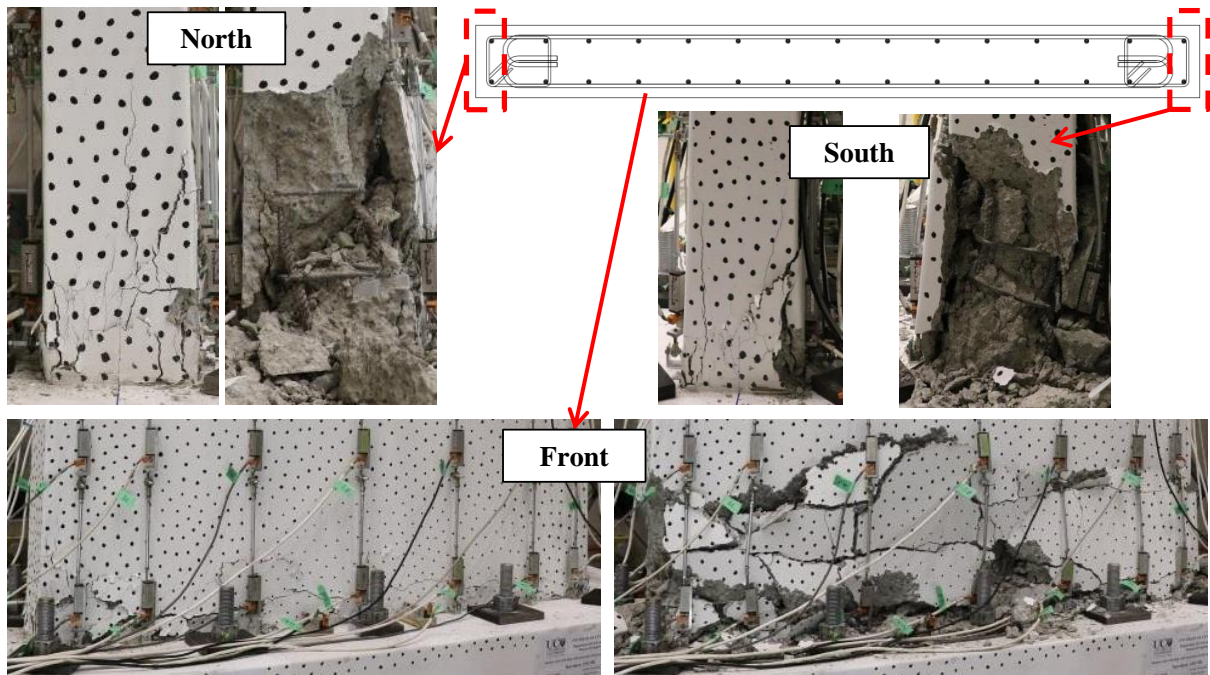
Specimen SP2-ND just before and after out-of-plane shear failure from three different faces
